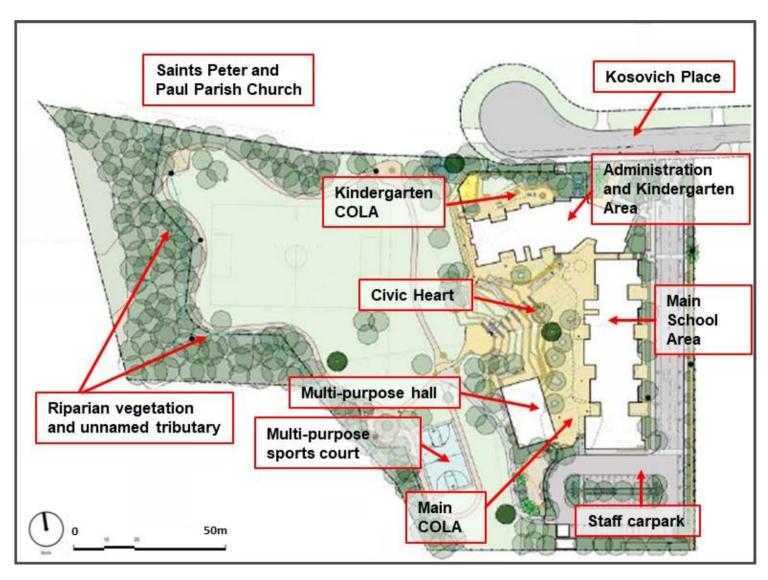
| Site masterplan (Source: Applicant's EIS 2018)
